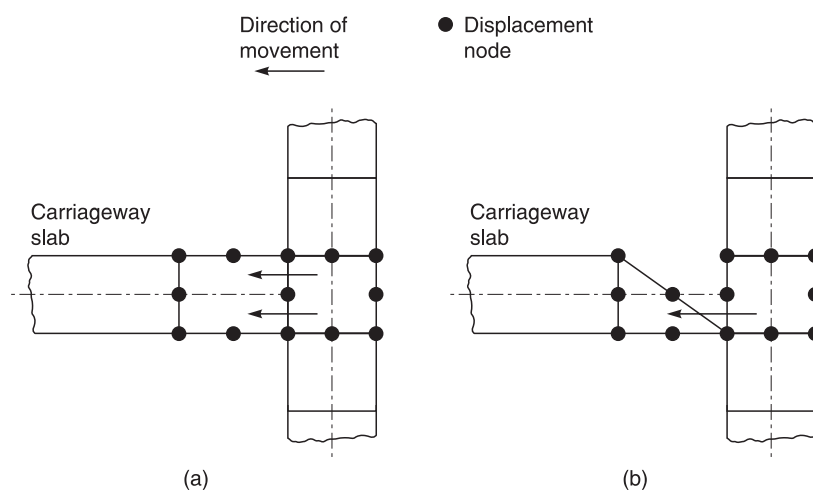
Detail of joint between wall and permanent slab: (a) rigid connections; (b) pinned joint
